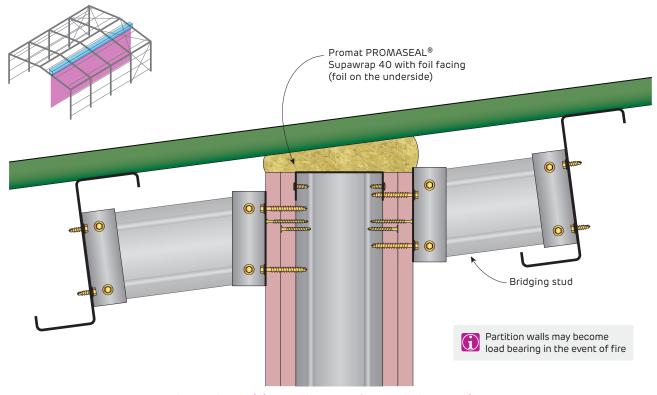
Partition Wall to Roof - Parallel to Purlins Up to FRL 120/120/120
